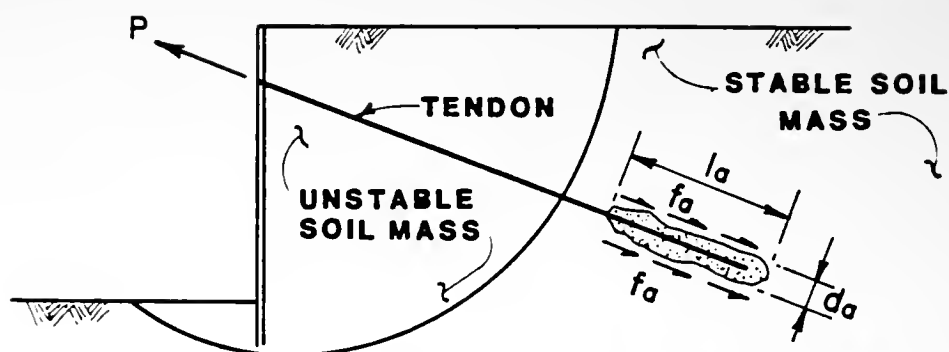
Intersection of Tieback Anchor with Trial Failure Surface
